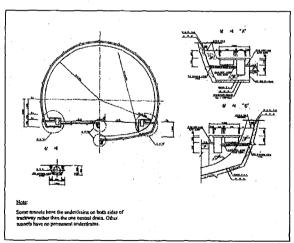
Typical Drainage Details for High Speed Rail Tunnels in Korea
